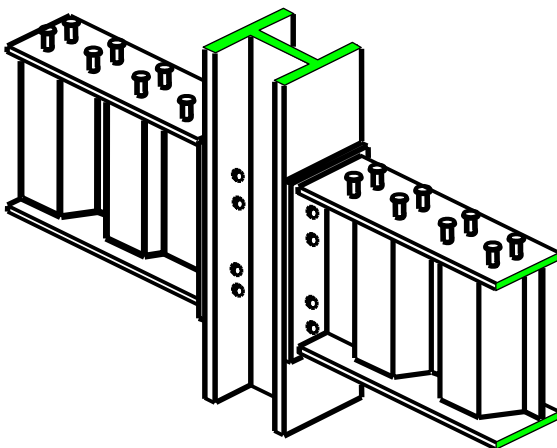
Typical flush-end plate connection for TWP section with studs connected to hot-rolled universal column (UC) section
